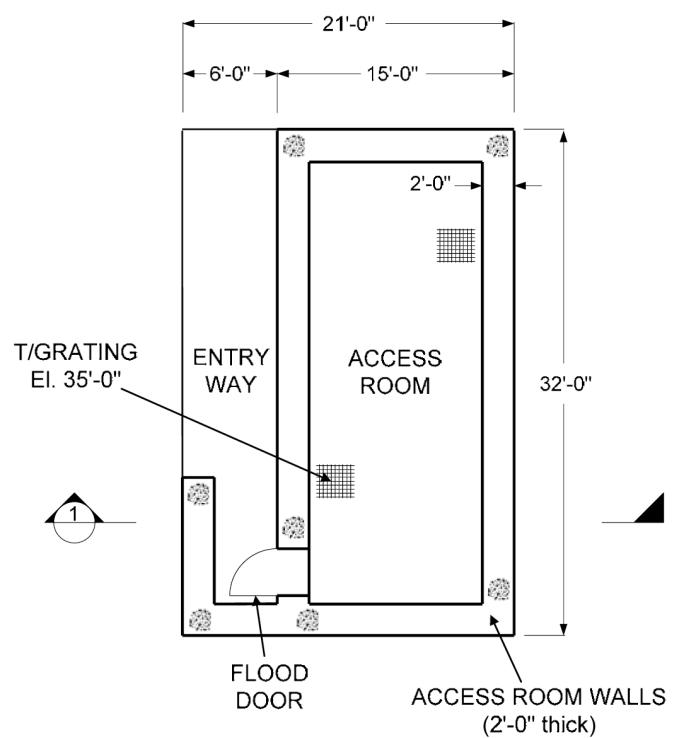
H.6-251 Plan View of DGFOSV at Elevation 35'-0"
